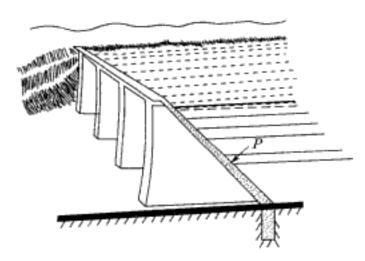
Buttress or hollow gravity type of masonry dam with flat deck
